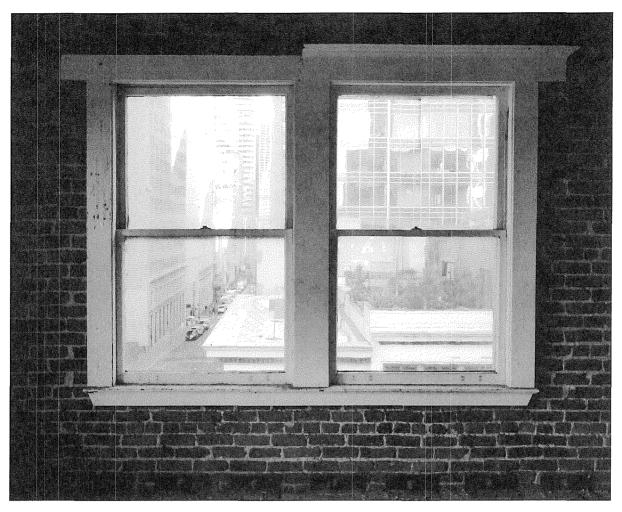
Detail photograph of typical double-hung windows at north and east walls (photograph taken on 02/27/2018).
